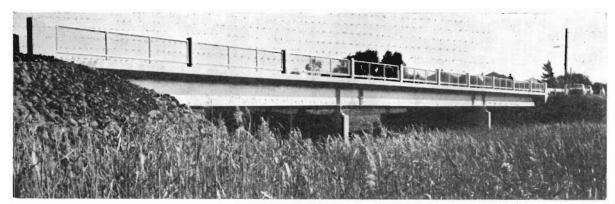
Corio Shire. Station Street. Hume Bridge over Hovells Creek at Lara.
